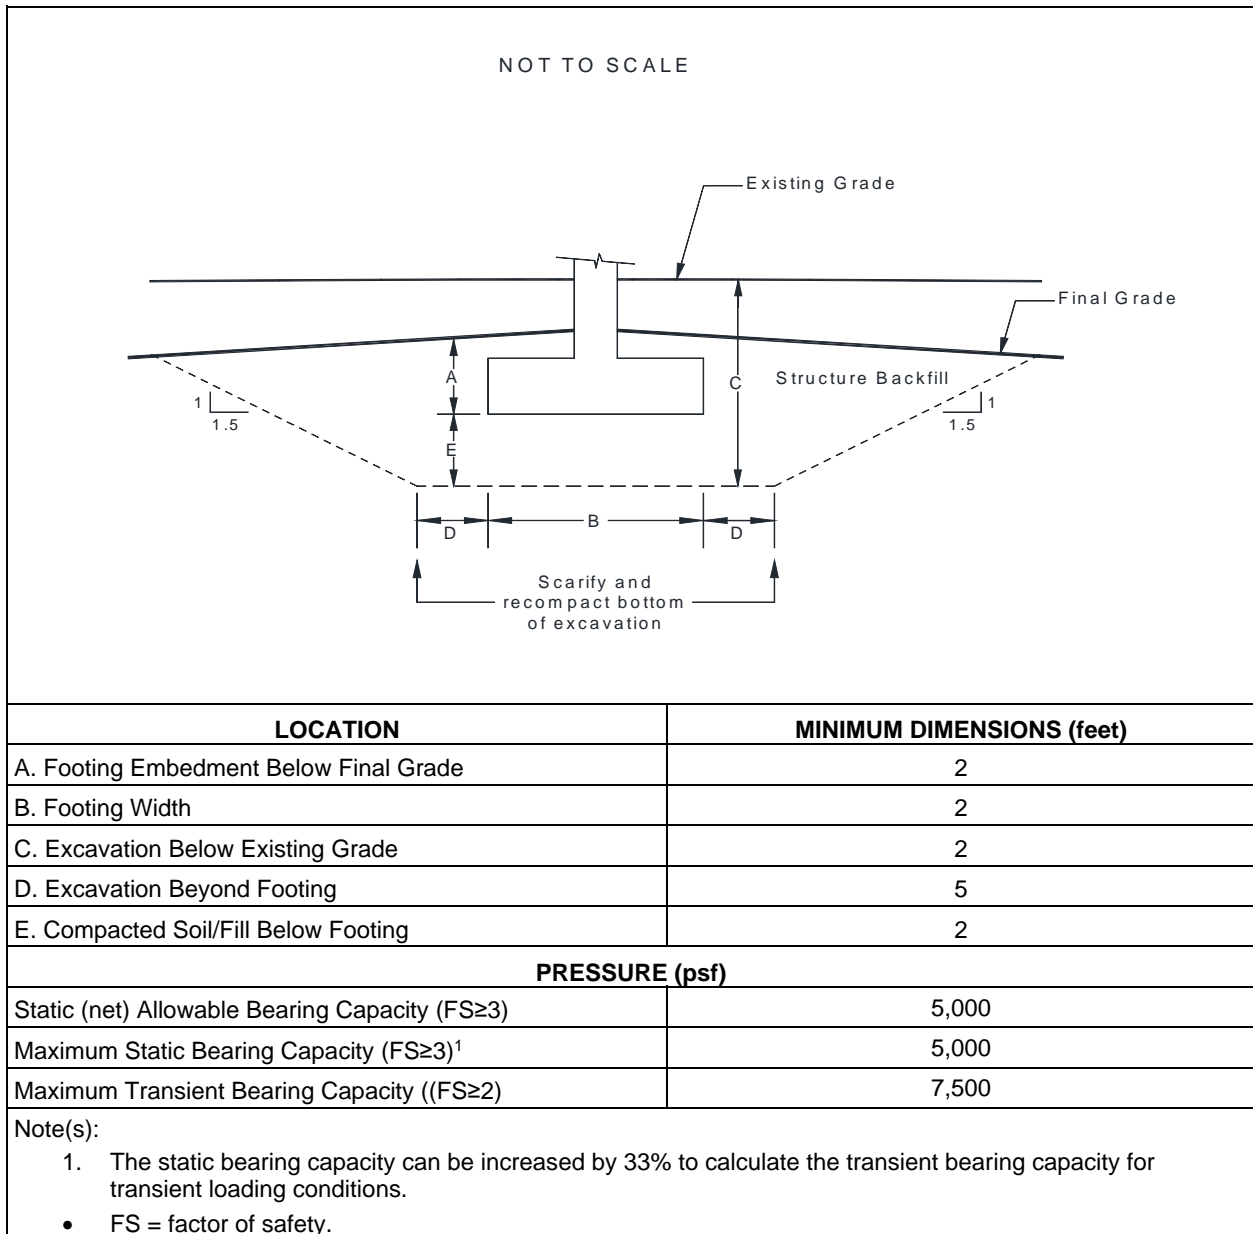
GRADING/FOUNDATION DETAILS (LIGHTLY LOADED SHALLOW FOOTINGS)
